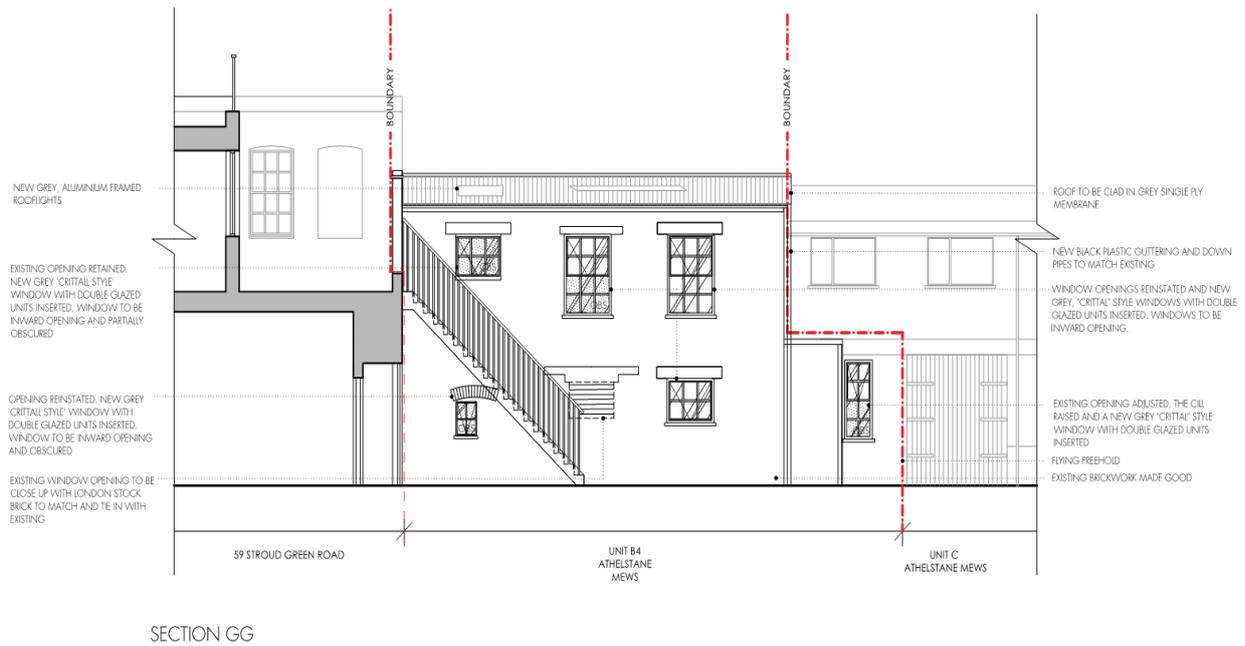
Elevation Facing Eastward onto Athelstane Mews/Stroud Green Road
